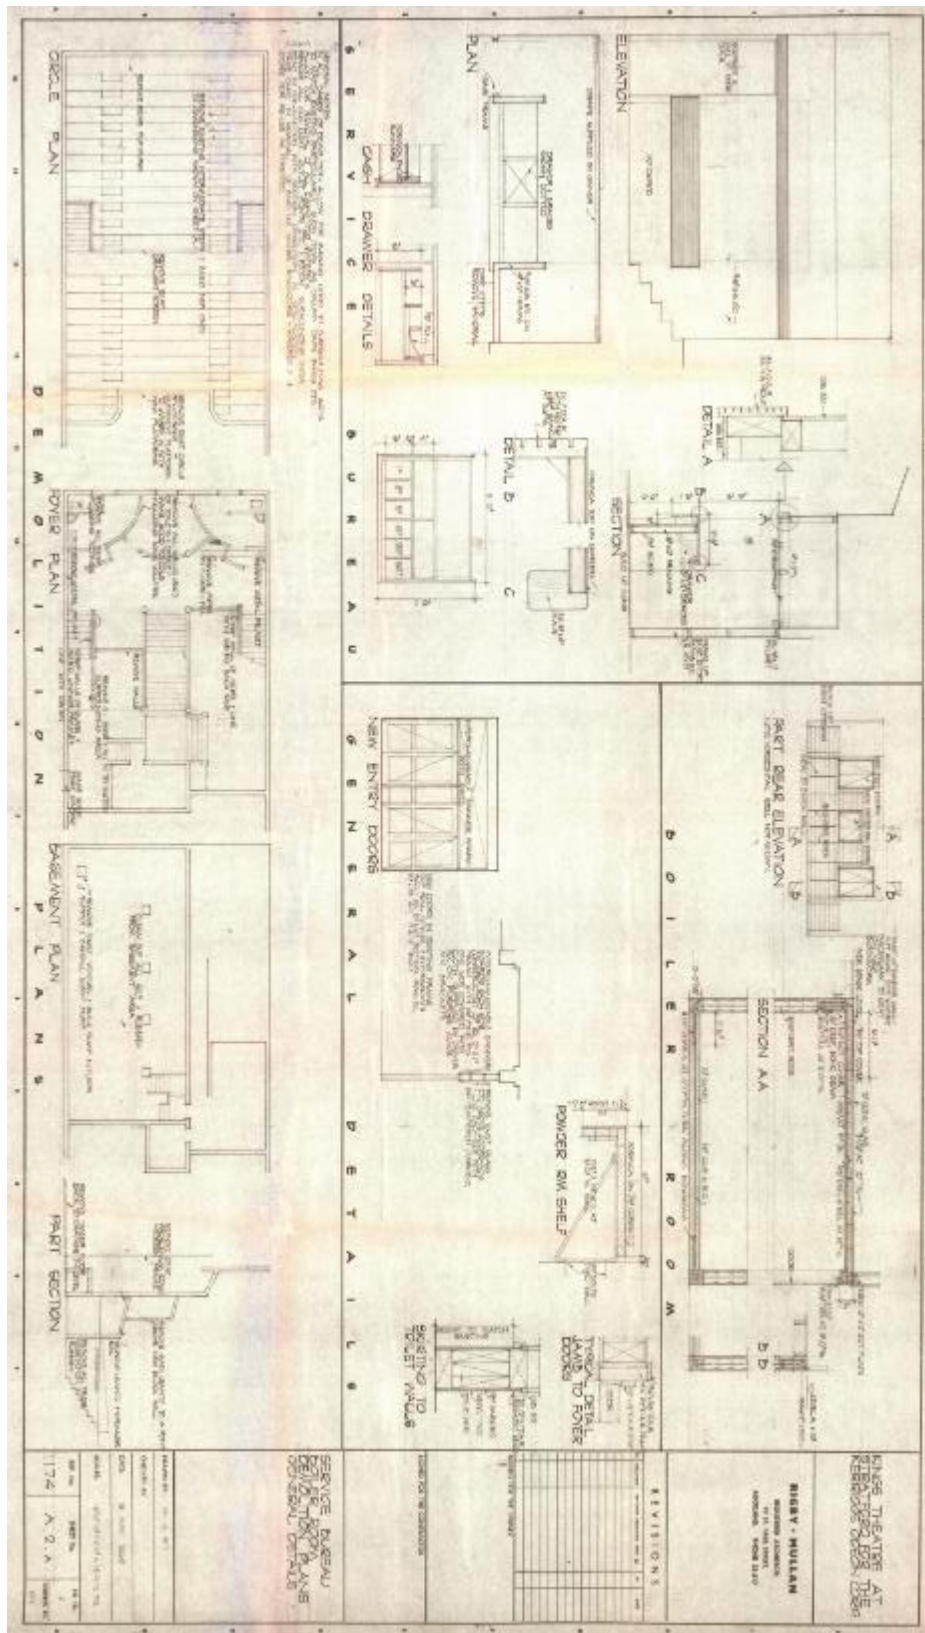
Rigby Mullan Architects, 'Kings Theatre: Alterations to Theatre – plan – demolitions, boiler room, service bureau', May 1969, Stratford District Council building file P1392
